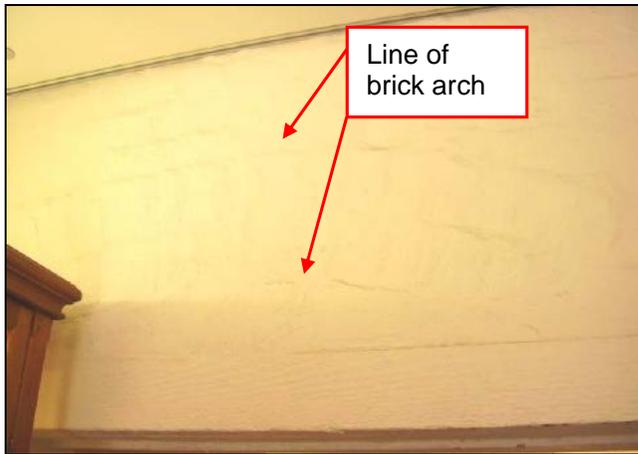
The shadow of a brick arch of the original opening in the cross wall remains over the enlarged opening.
